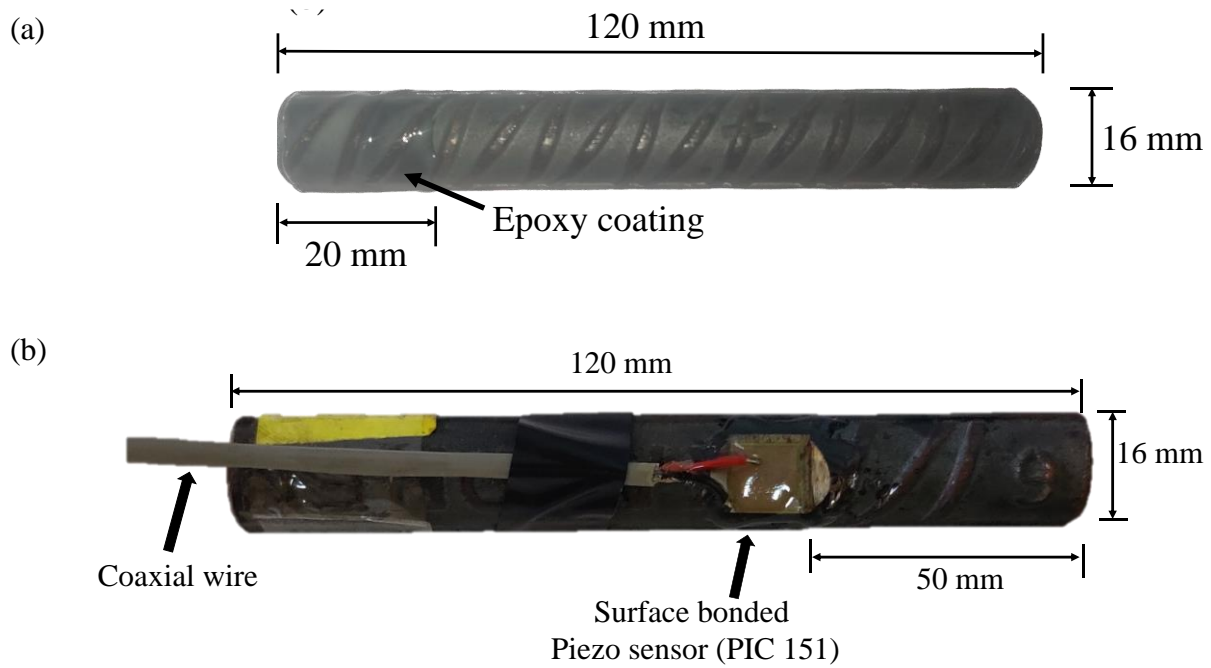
Cross sectional details of bare steel specimen (a) Electrochemical measurement; (b) EMI studies in in RC concrete
